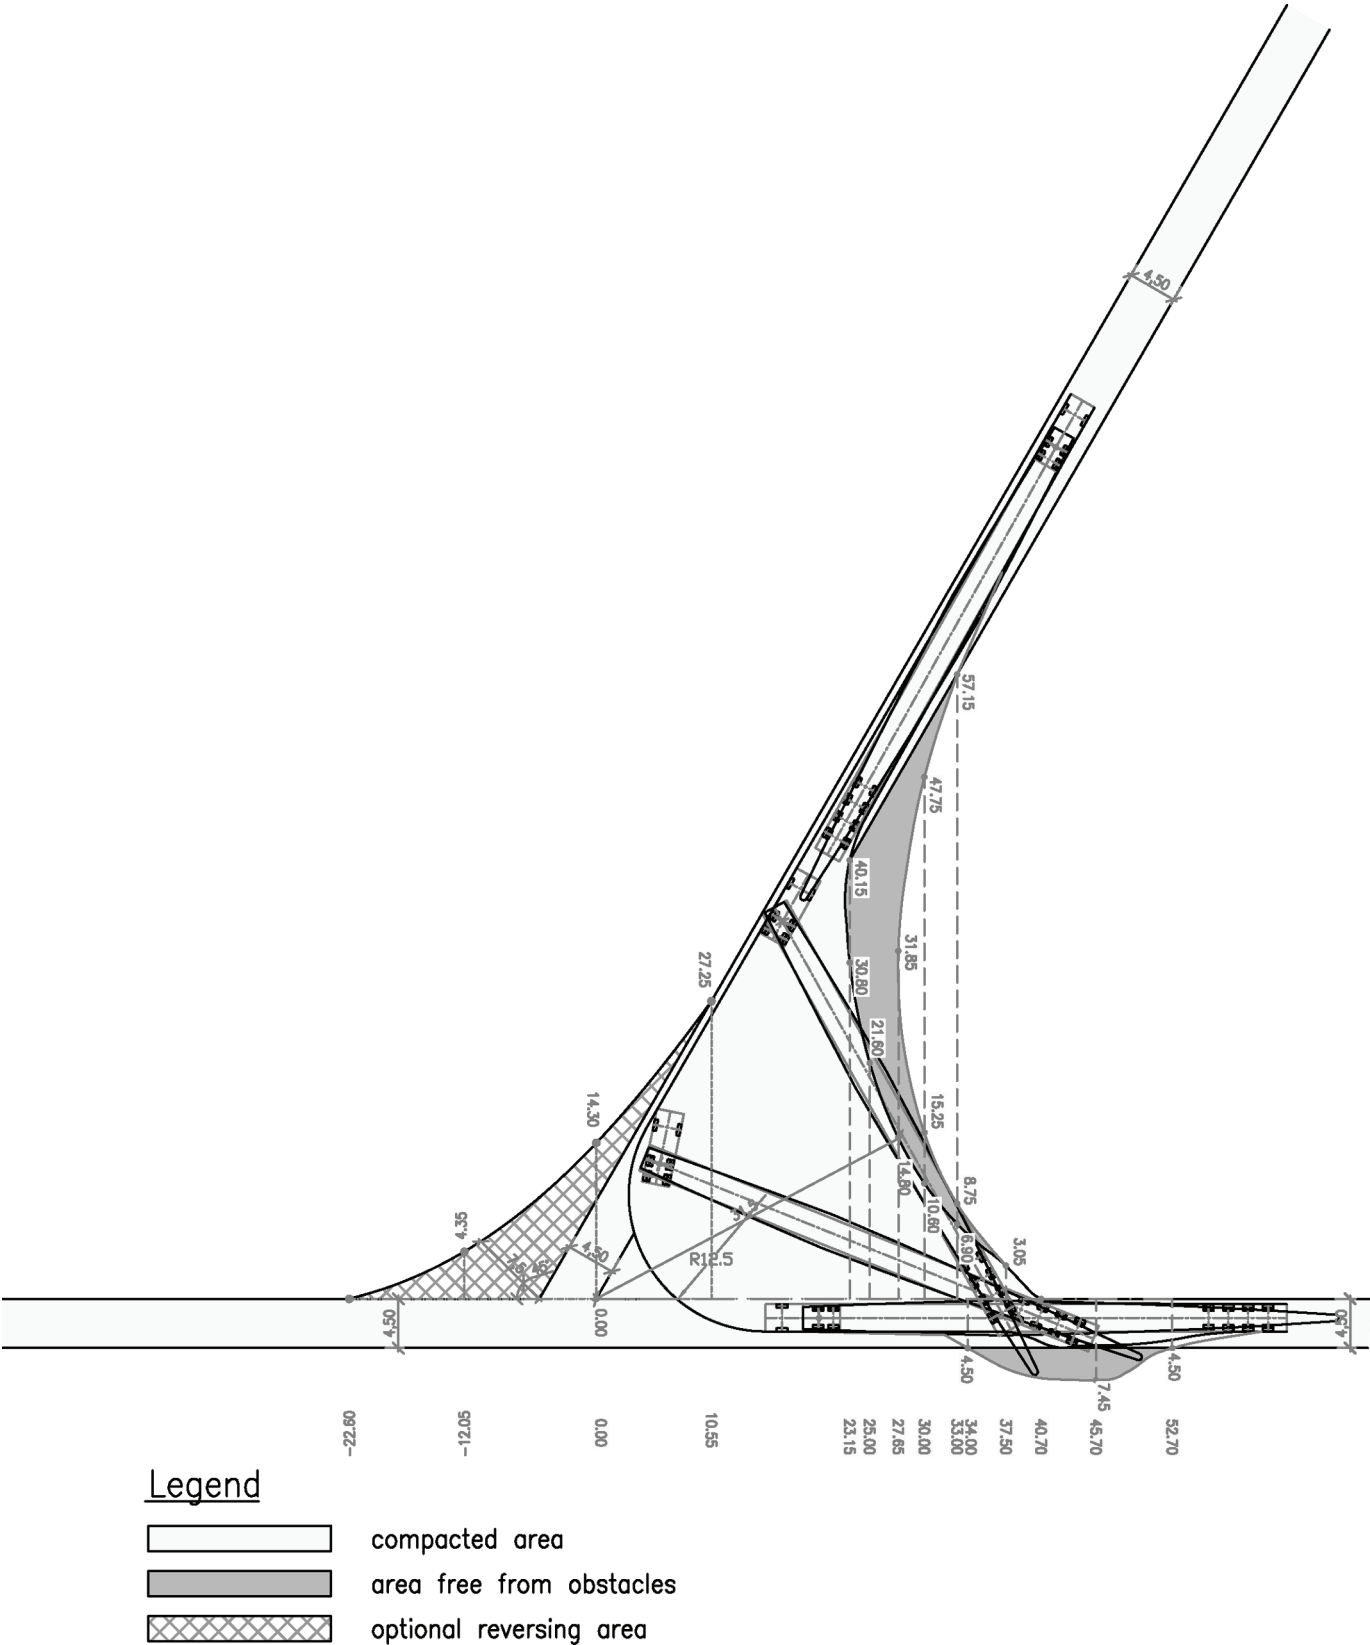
Truck with rear axle steering, outside radius 12.5m / turning angle 120°
